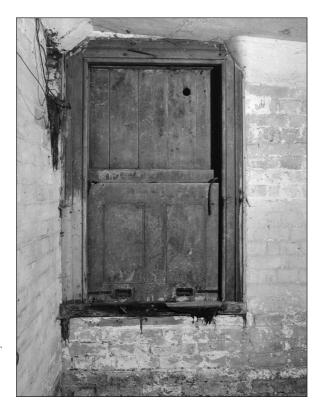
Interior of shifting lobby (room 1) showing the barrier rebate and first aid sign (AA00/8505)
